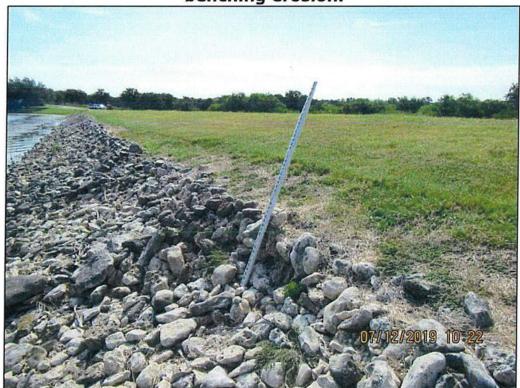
Upstream slope. Mid embankment. Looking left. Note displaced riprap and benching.
